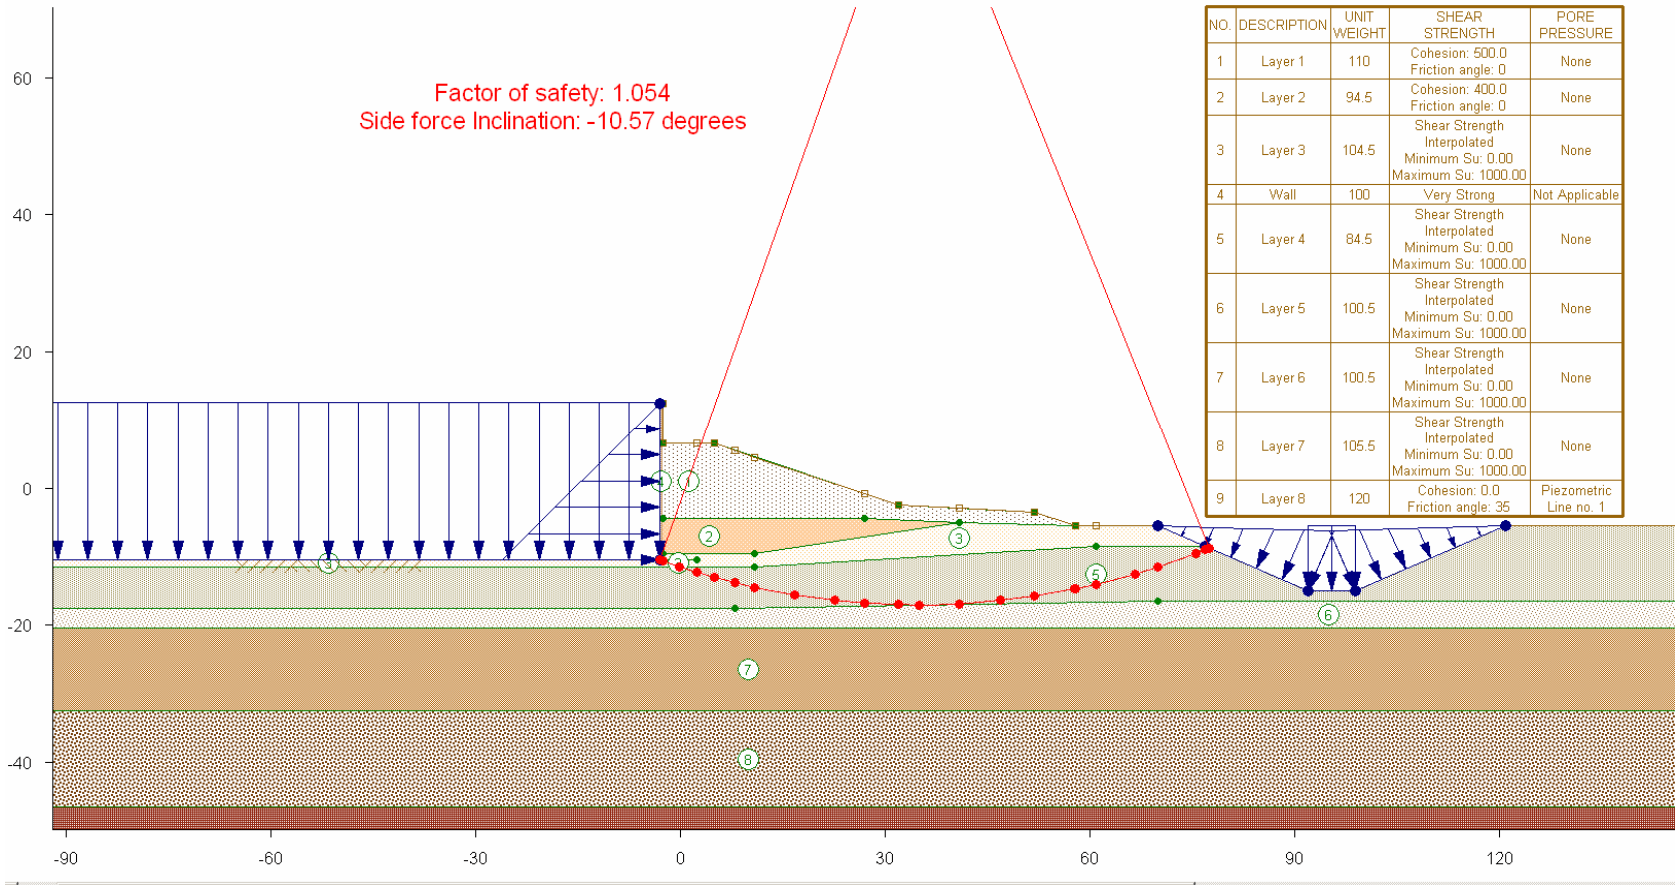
IHNC – East Bank (GDM Stability Plate), Case 4, Canal Water Level = Top of Wall - 12.5 ft (NAVD 88), with Crack.
